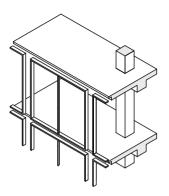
Concrete members (primary loadbearing structure) with lightweight metal frames (secondary structure) Frames fitted to edges of floor slabs
